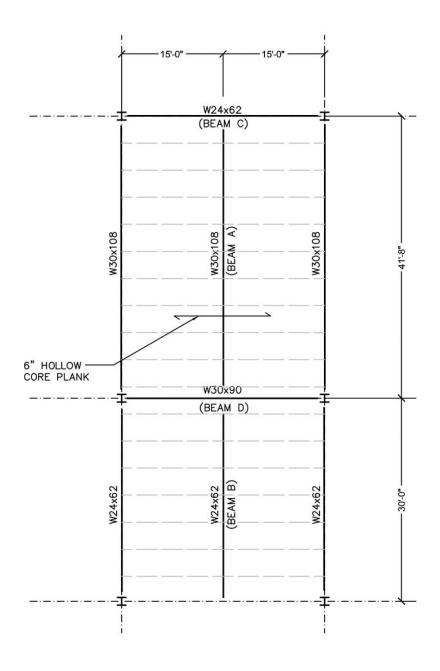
TYPICAL HOLLOW CORE LAYOUT
